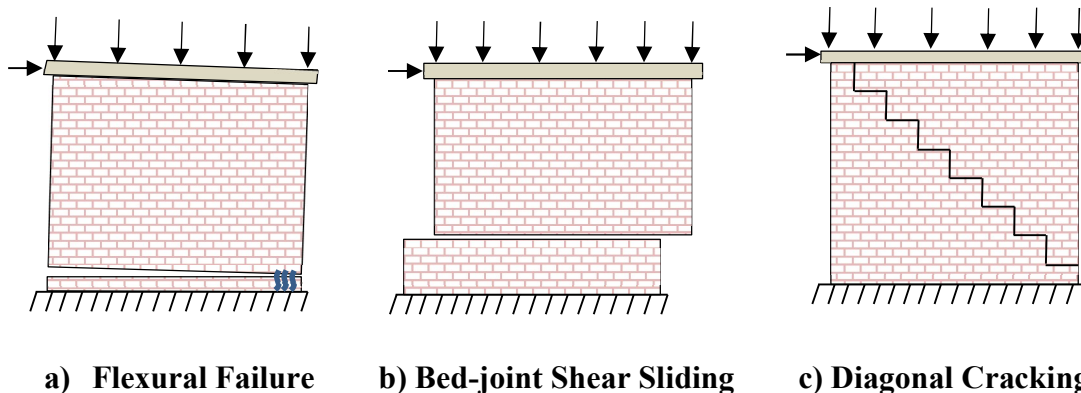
In-plane Failure Mechanisms of URM Walls/Piers
